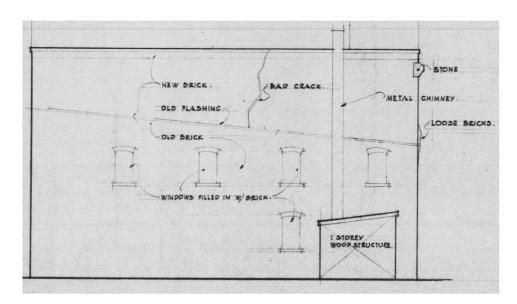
Detail of a 1977 illustration showing the rear or east façade of the building, with all windows apparently blocked. 83
